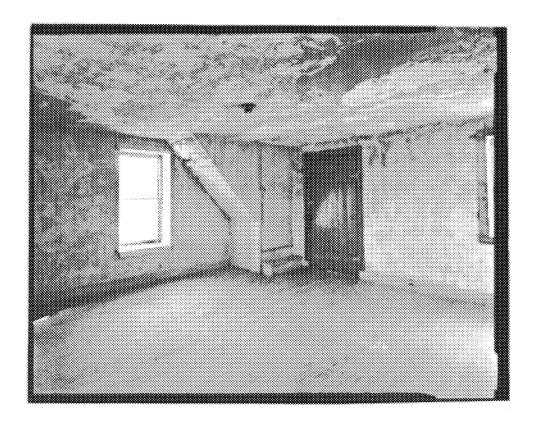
Hampton Quarter 3, first floor: perspective of stair in west corner of southwest room looking west.
